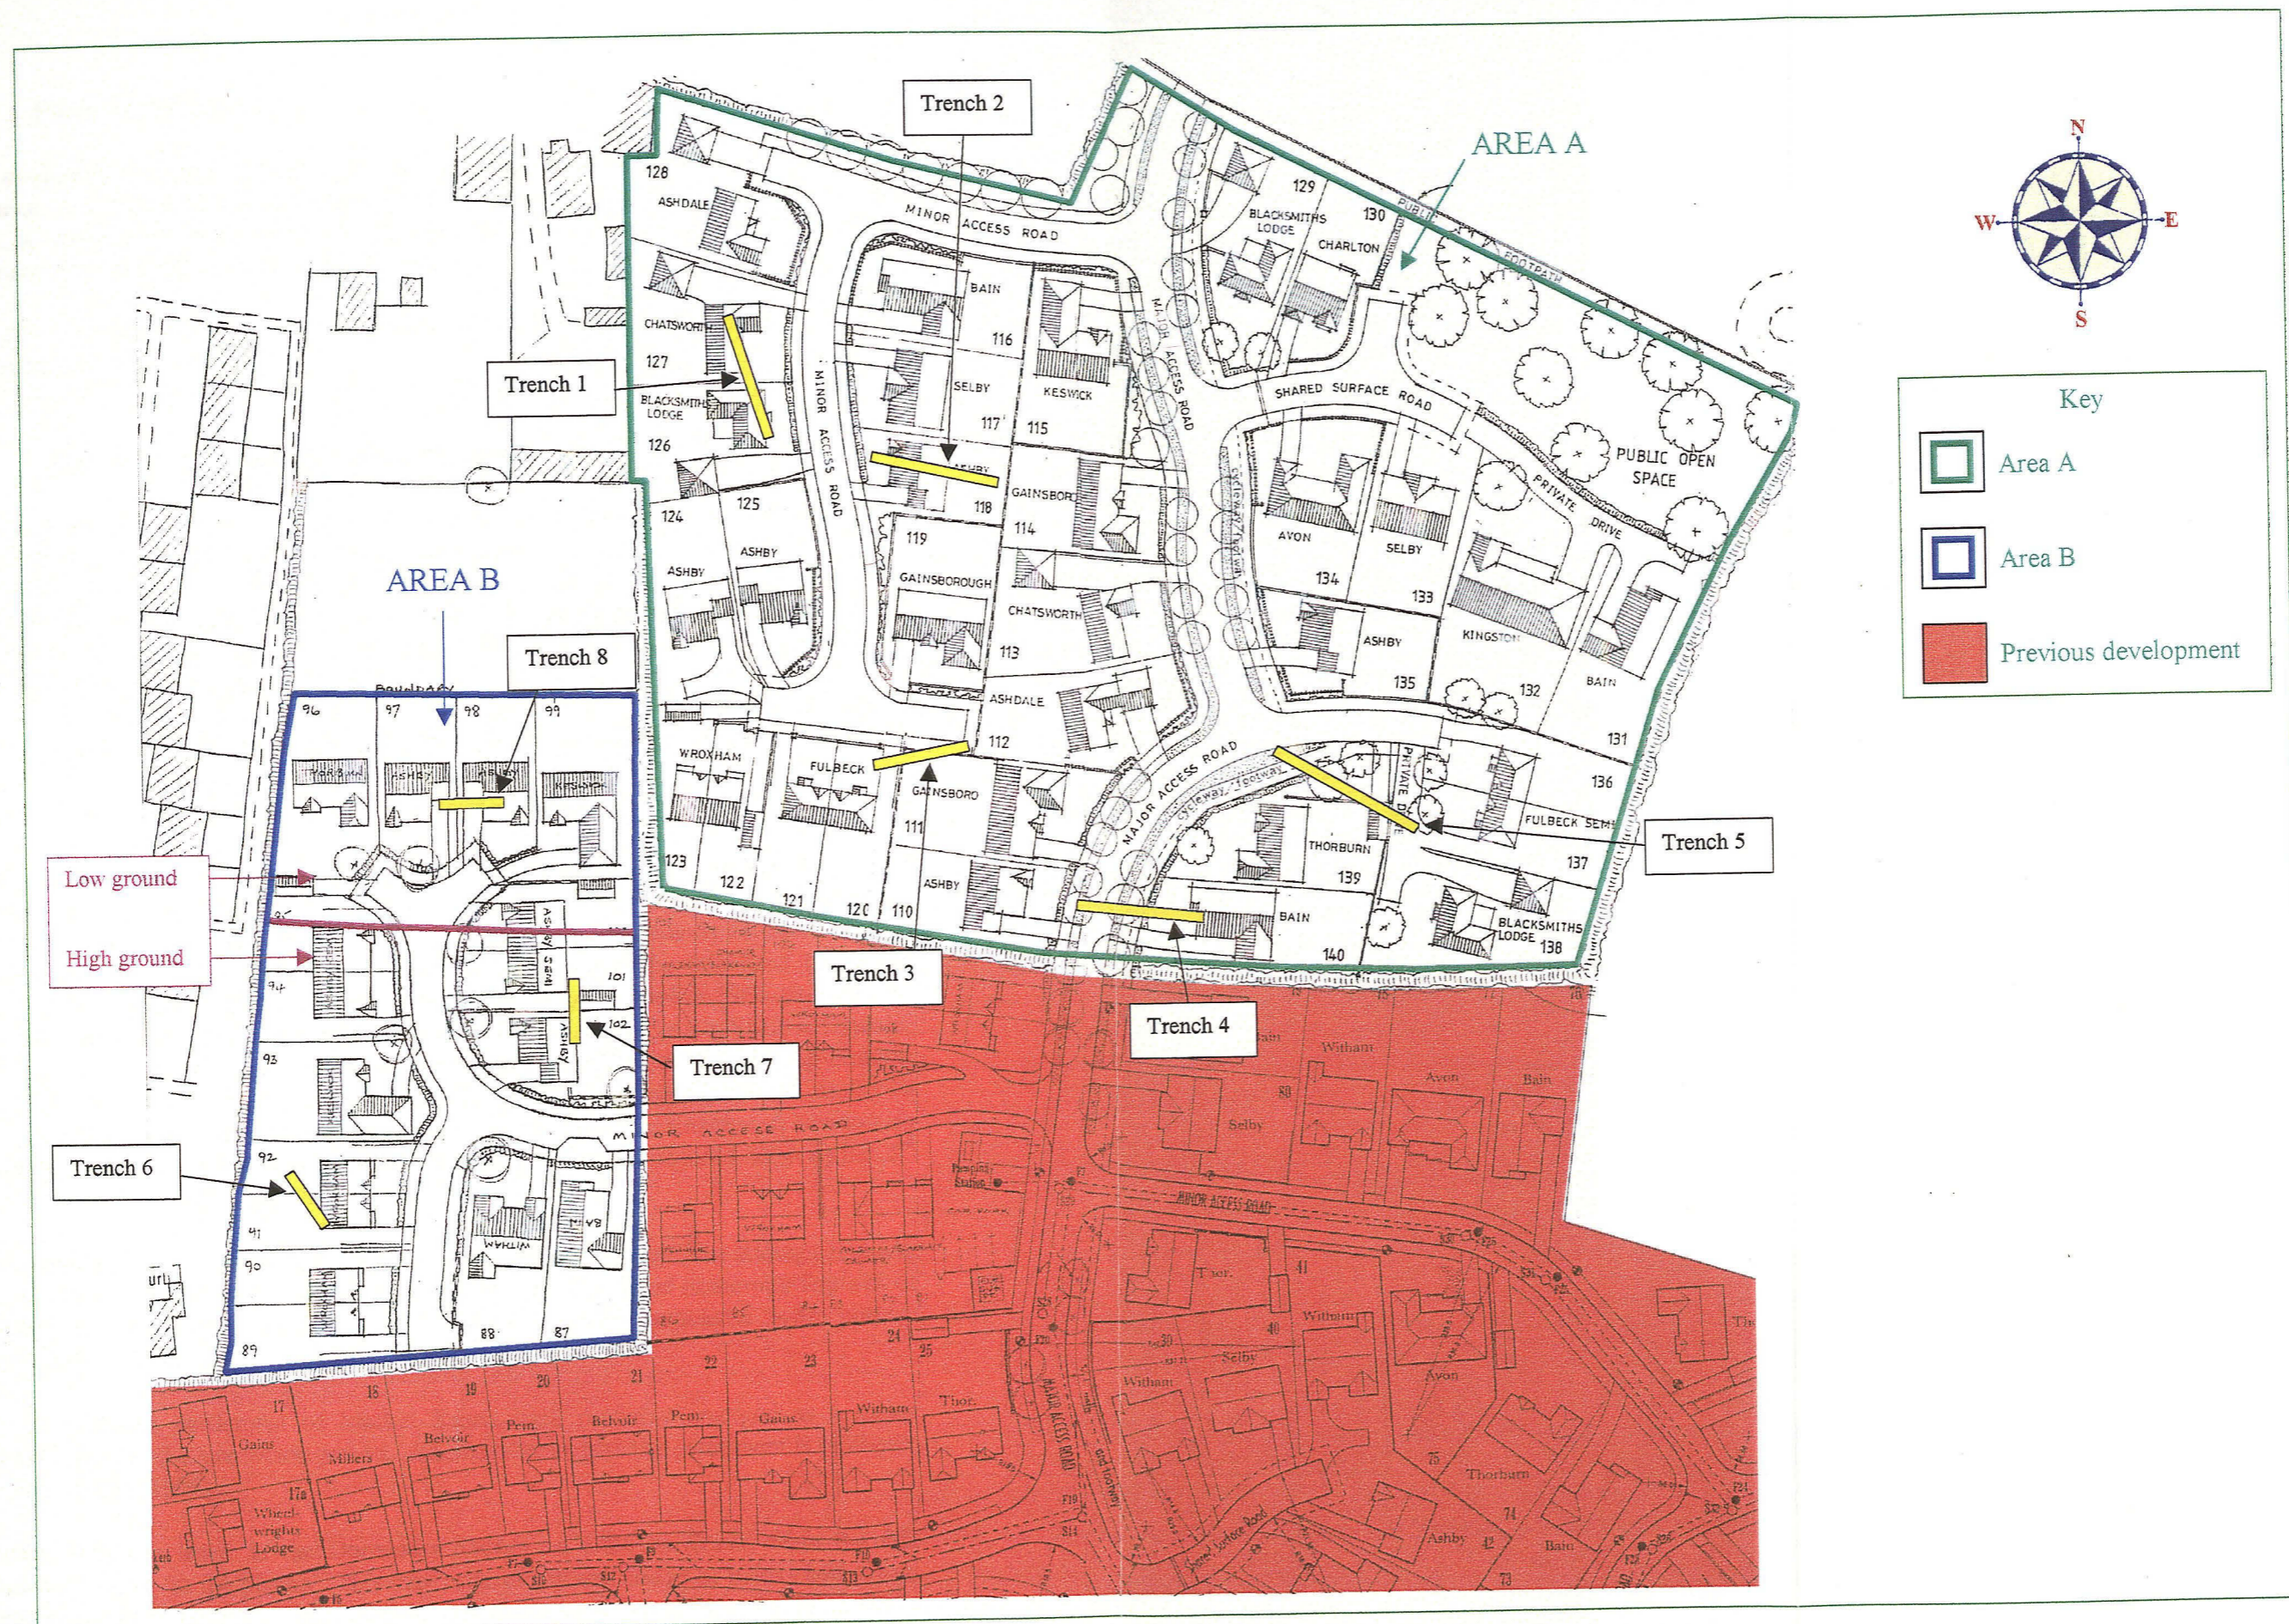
Location of trenches superimposed over proposed development plan at scale 1:1000
